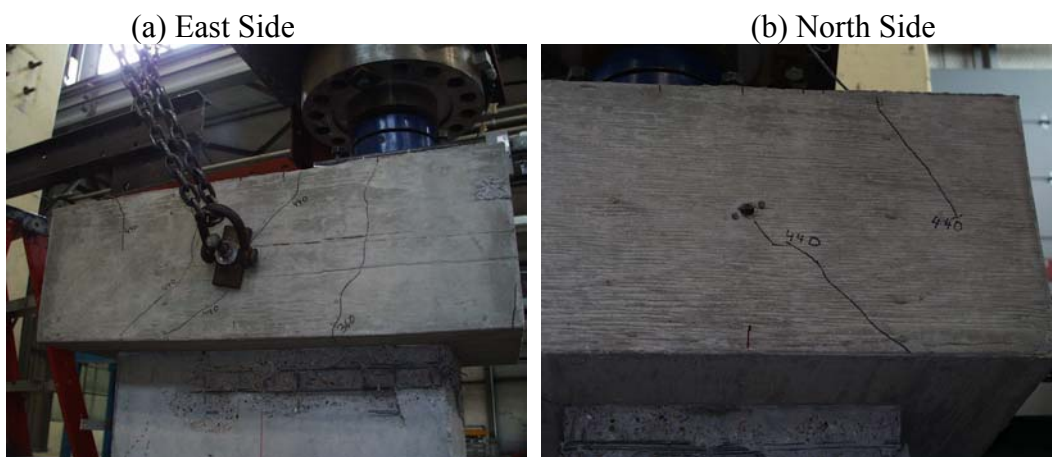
Specimen P14: Vertical Cracks at Top End Block
